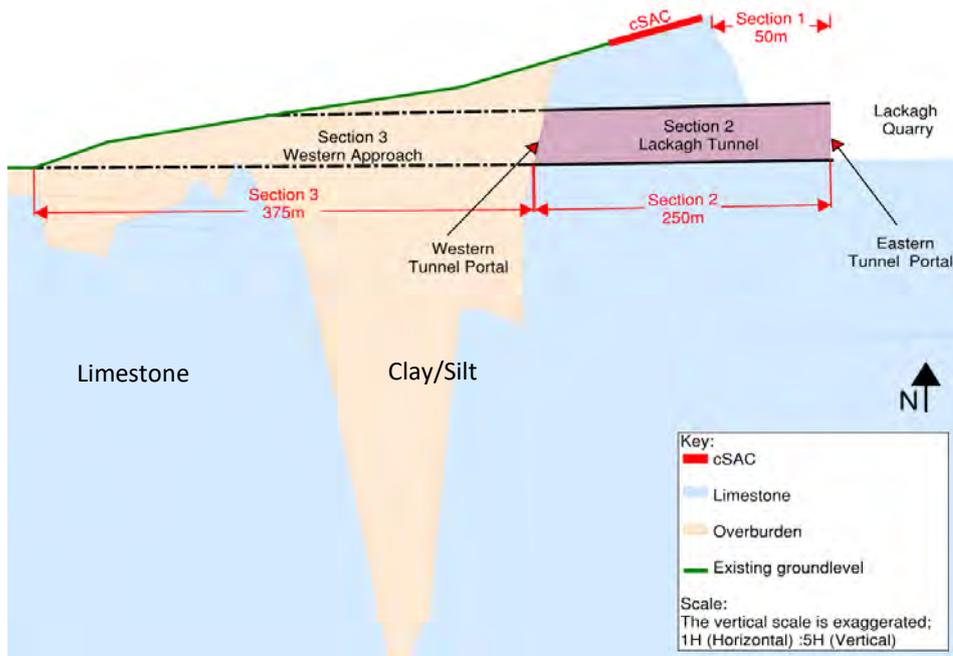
(b) - Plan overview of Lackagh Tunnel (Section 2)
